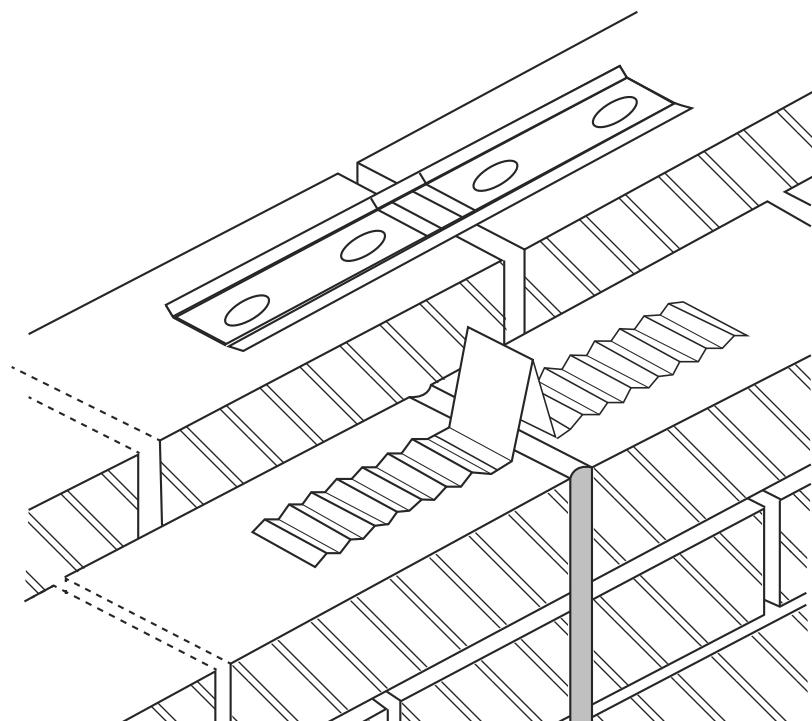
Articulation joint in unreinforced single leaf masonry wall with compressed foam
